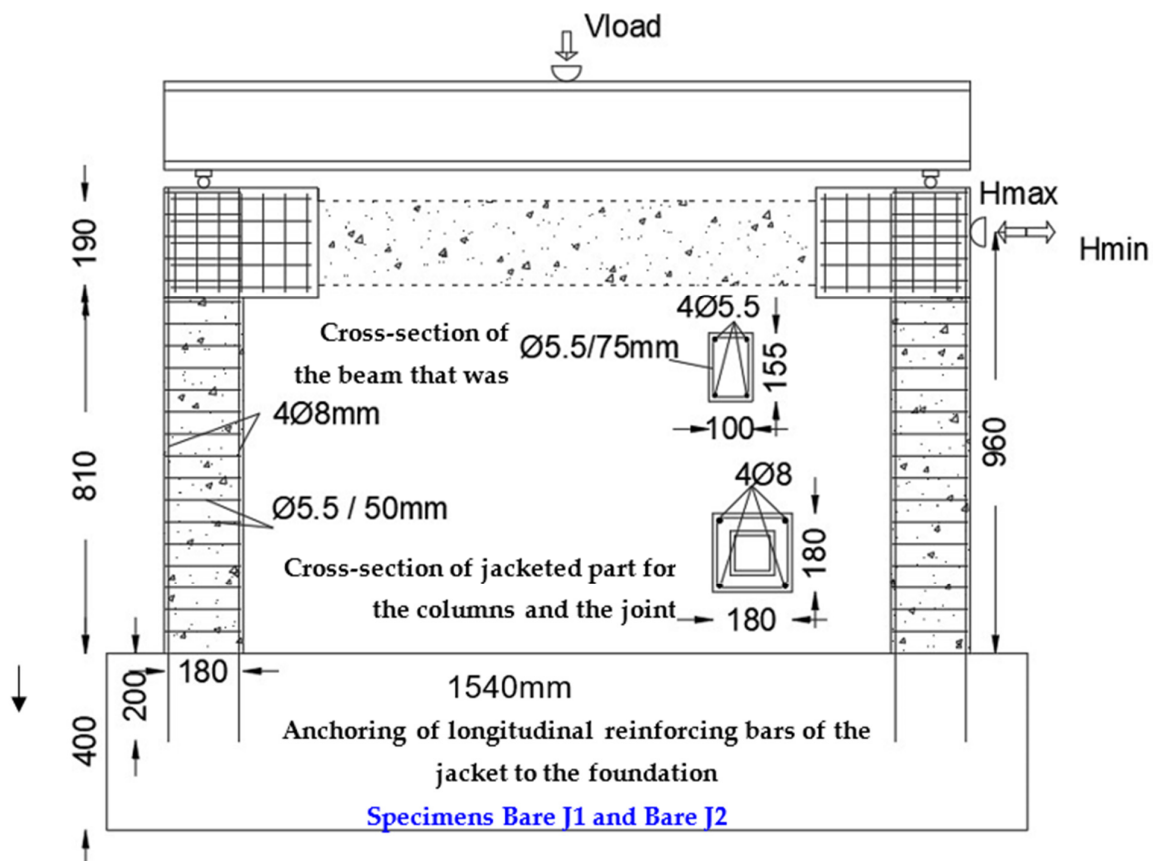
Specimens Bare J1 (Bare Jacket1) and Bare J2 (Bare Jacket2).
